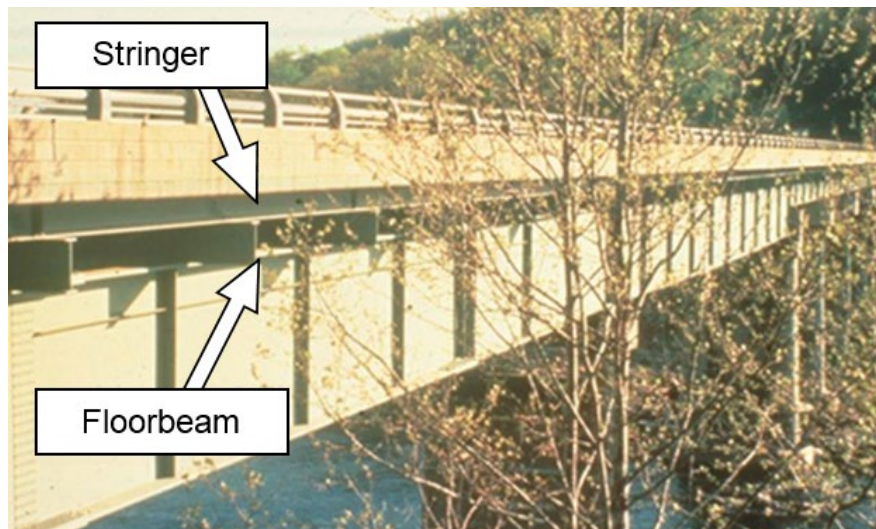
Floor System with Stacked Floorbeam Stringer Configuration
